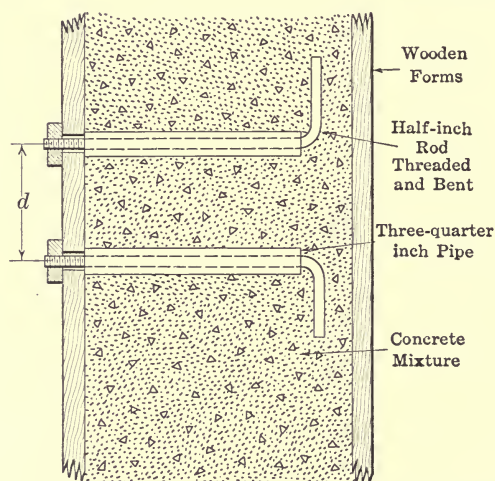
CLAMPING BOLTS IN CONCRETE WALLS.
